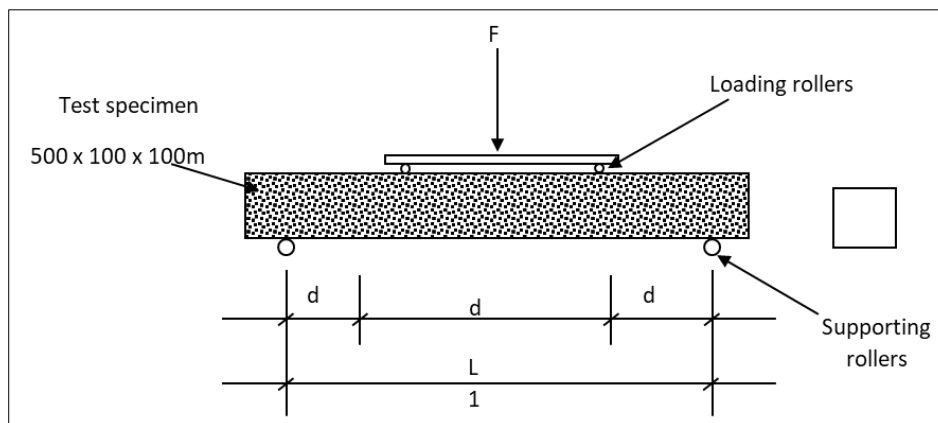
Arrangement of loading (2-point loading) for flexural strength
